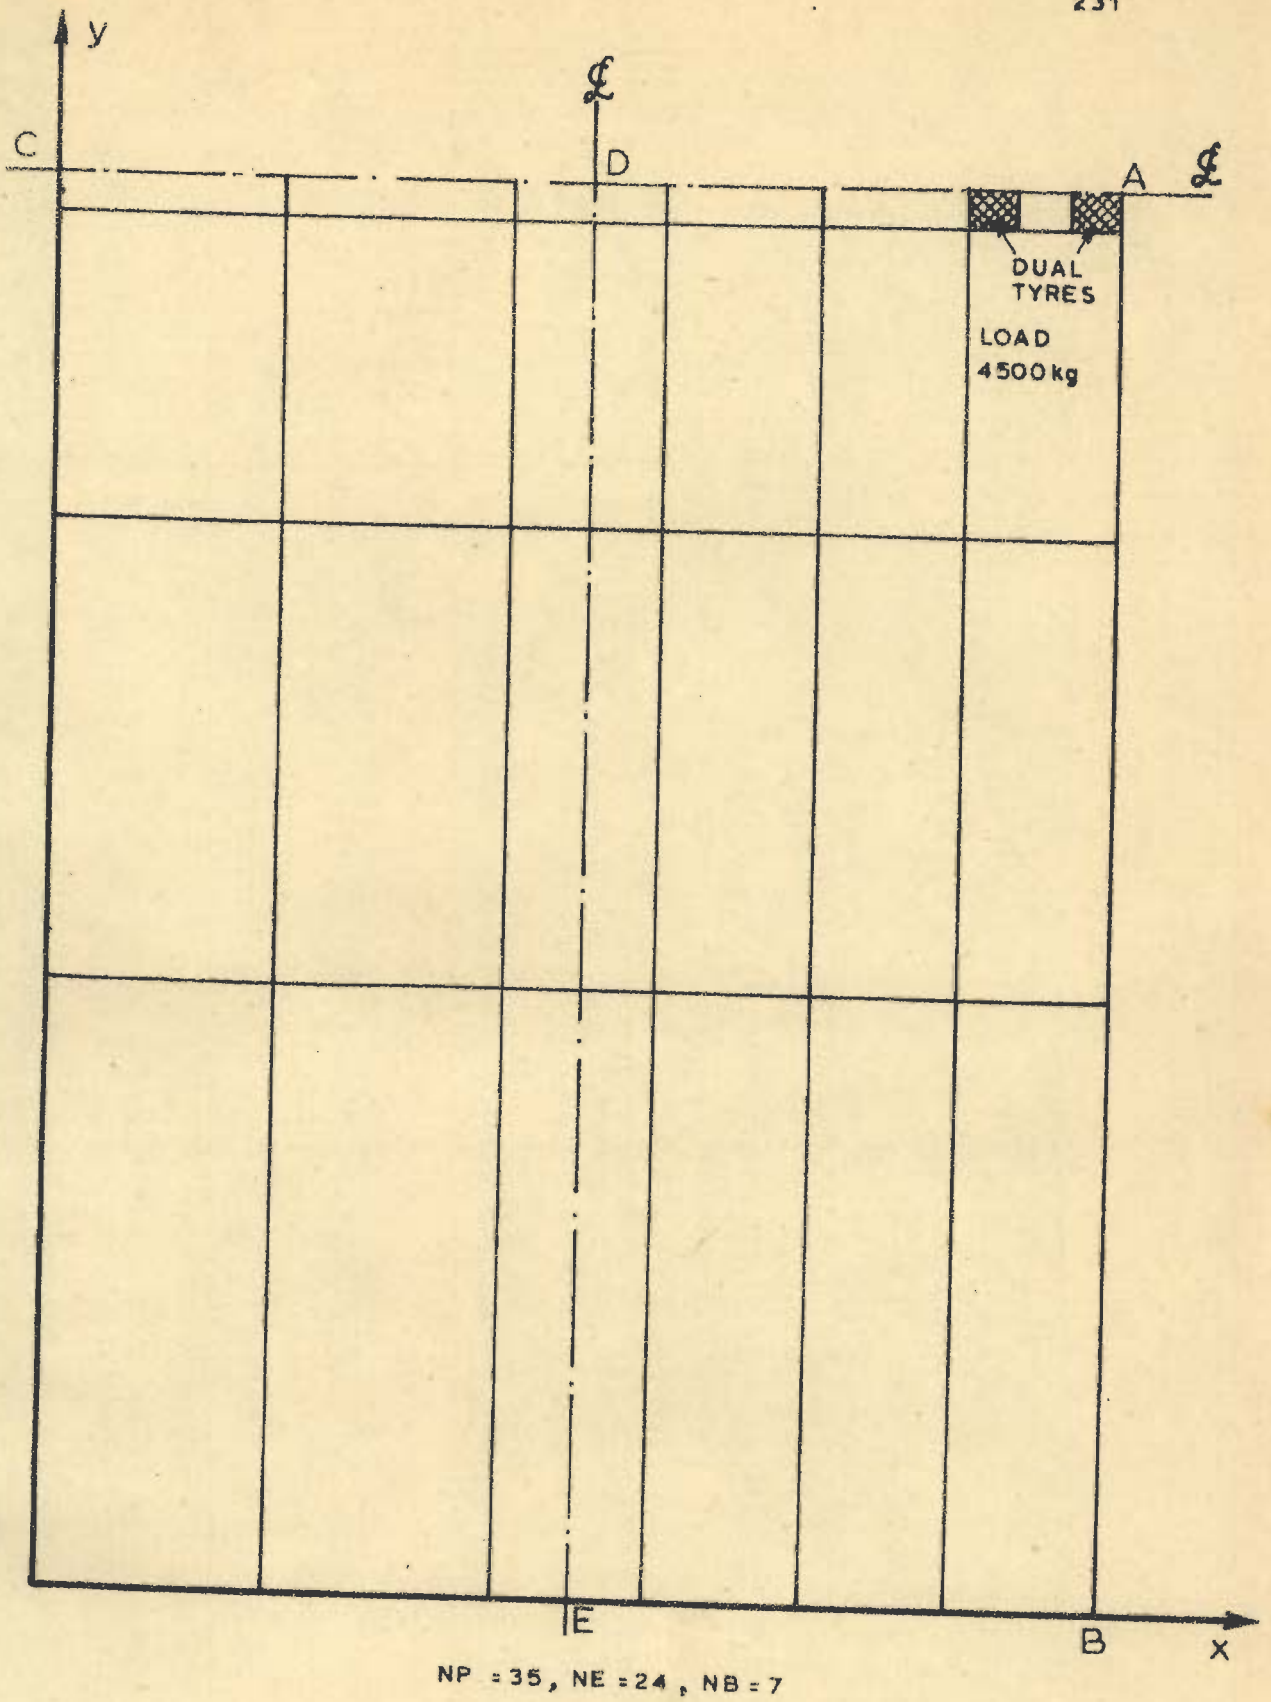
A TYPICAL FINITE ELEMENT IDEALIZATION OF PAVEMENT SLAB BY RECTANGULAR PLATE BENDING ELEMENTS
